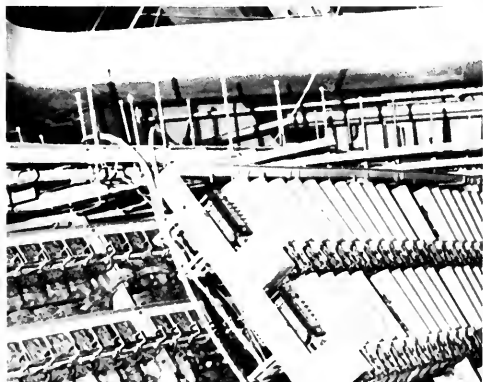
Telephone equipment damage, basement of Medical Treatment Building. John Meehan photo.
